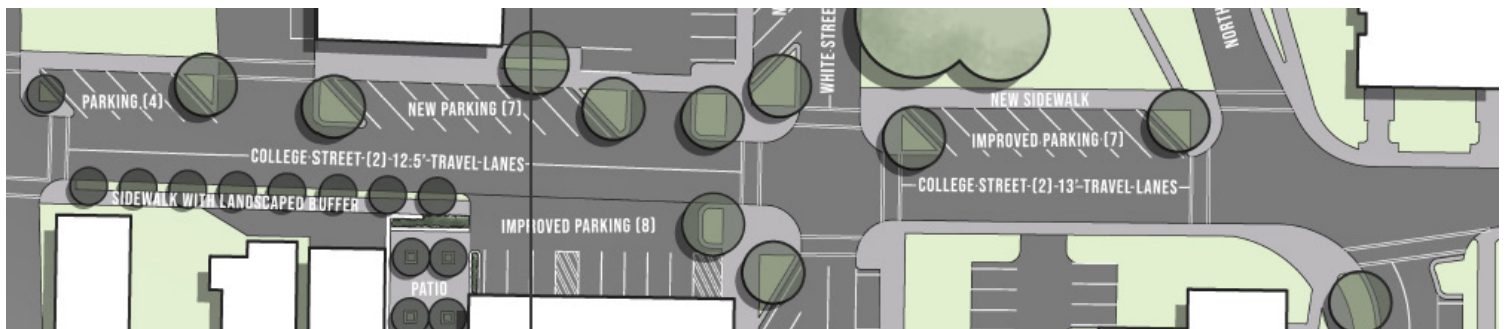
Preferred concept for College Street: Remove 2 travel lanes, narrowing College Street travel lanes. Replace with sidewalks, landscaped buffers, planted curb extensions, and on-street angled parking. New crosswalks at College and White
